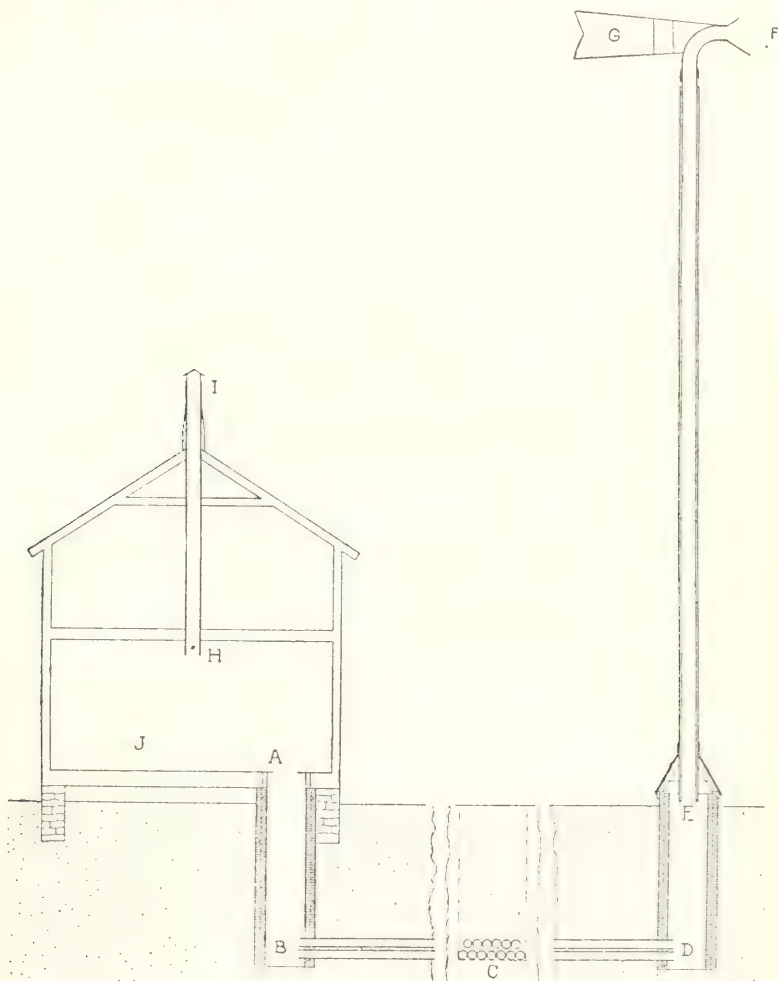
Fig. B. Section of cheese-curing room and horizontal multiple sub-earth duct. A, inlet to curing room; B, end of sub-earth duct in bricked entrance to factory; C, cross-section of the multiple ducts; D, E, bricked entrance under funnel at outer end of sub-earth duct; funnel with mouth 36 inches across; G, vane to hold funnel to the wind; H, ventilating flue with damper.
